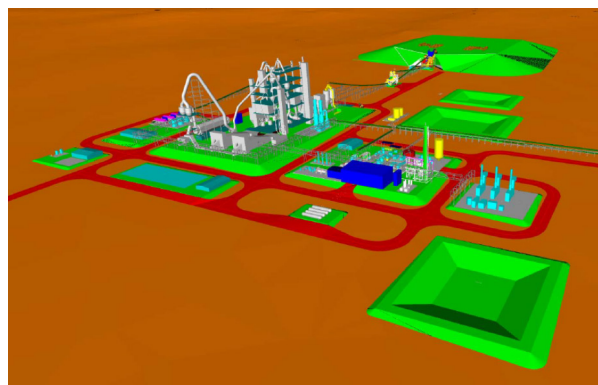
FIGURE: Oblique view looking south-east at the Oxley process plant, pit and mine waste facilities designs.
